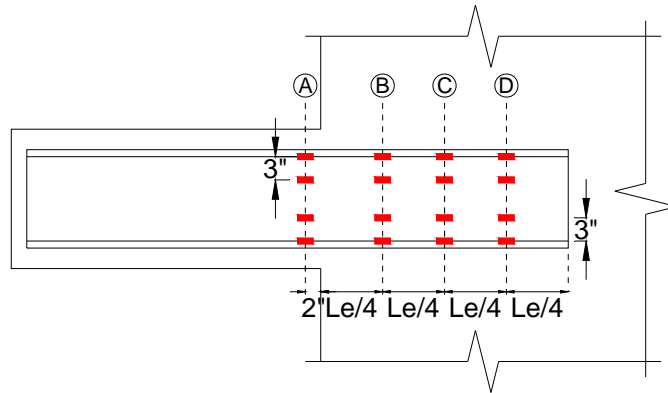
Strain Gage Layout for Sub-Assembly #2
